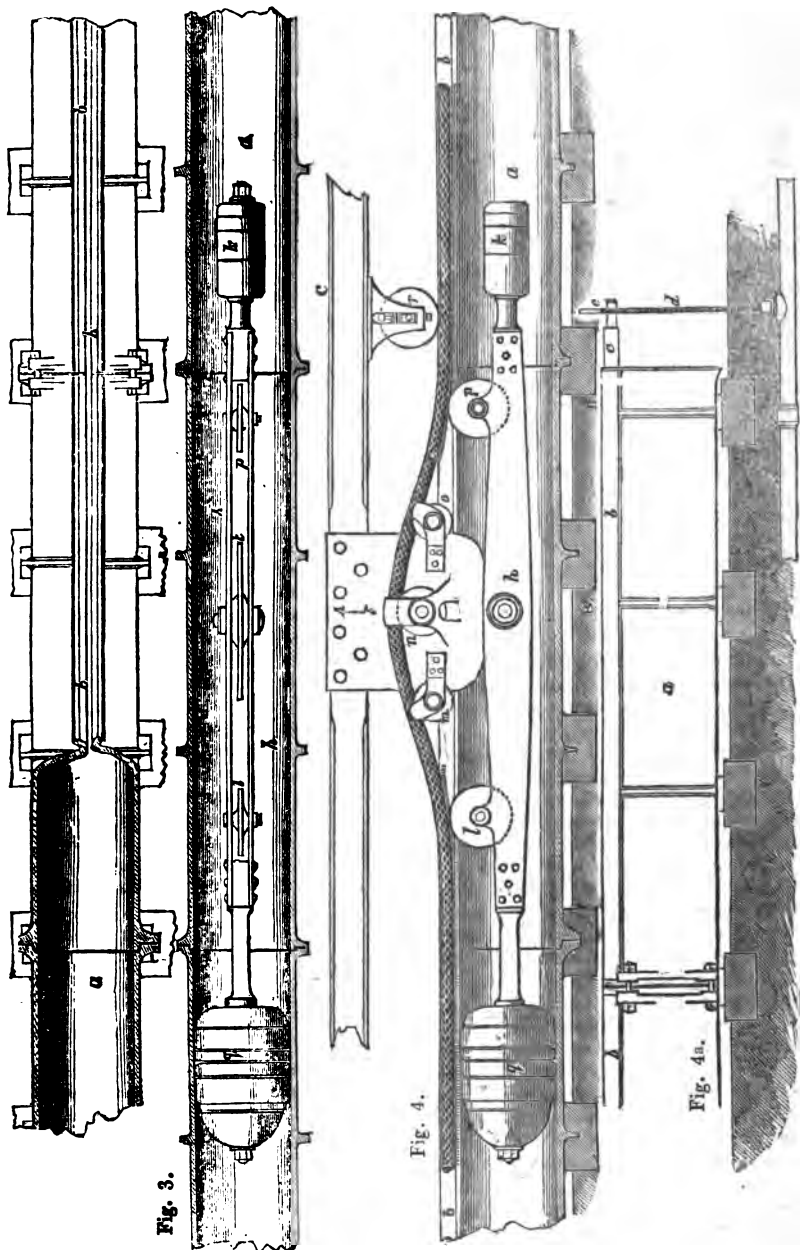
is a vertical section of the tube, and elevation of the piston.
